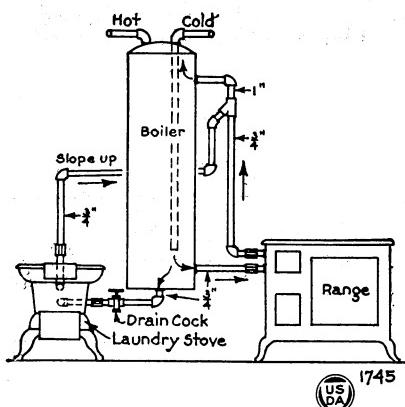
Boiler connected with a kitchen range and a laundry stove.
